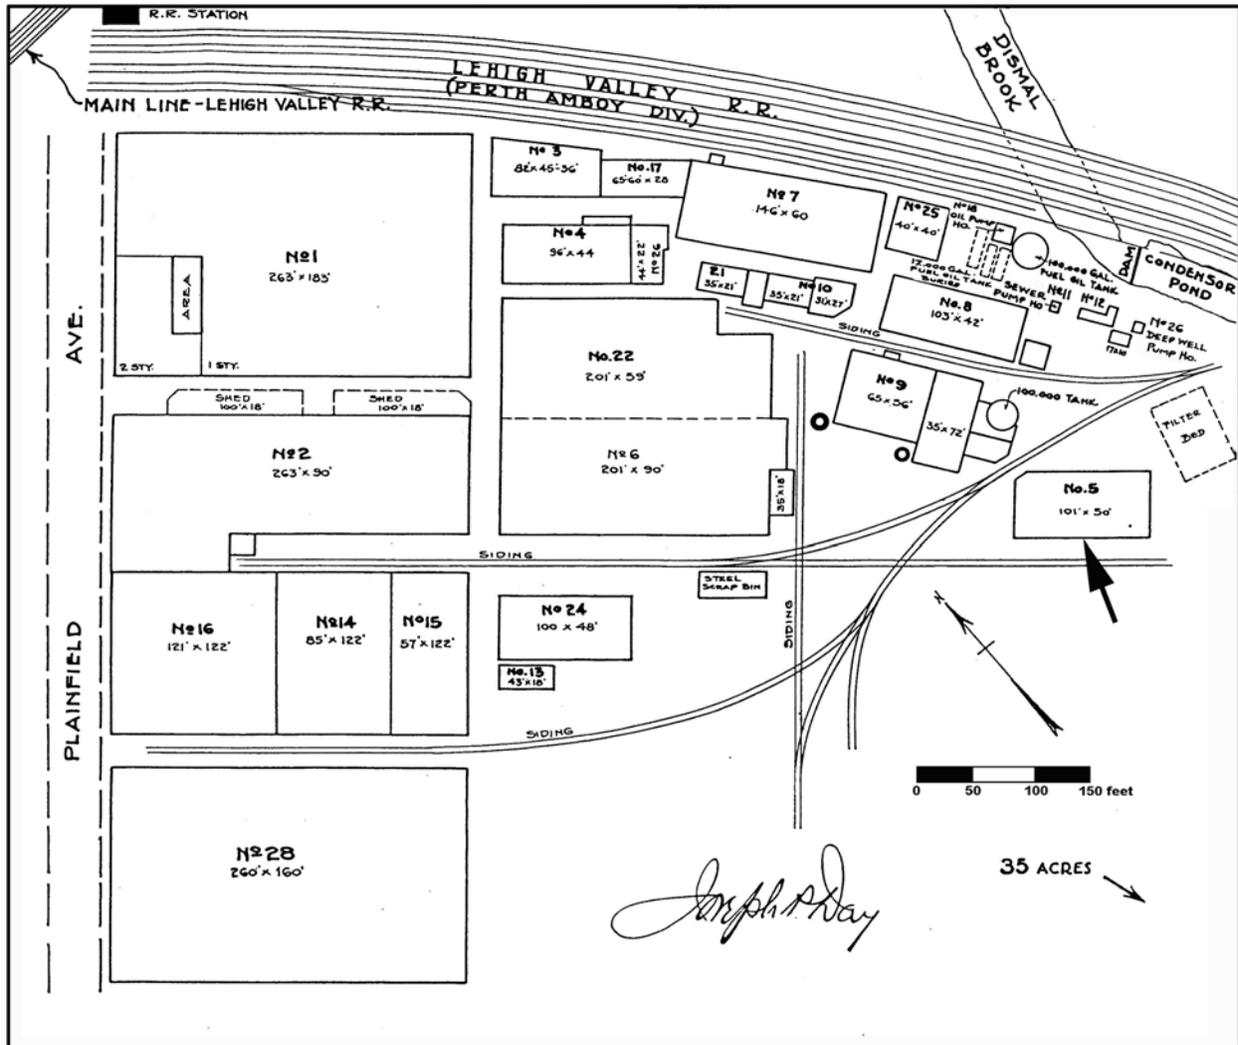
BUILDING 5 AND 1929 SOUTH PLAINFIELD WORKS
